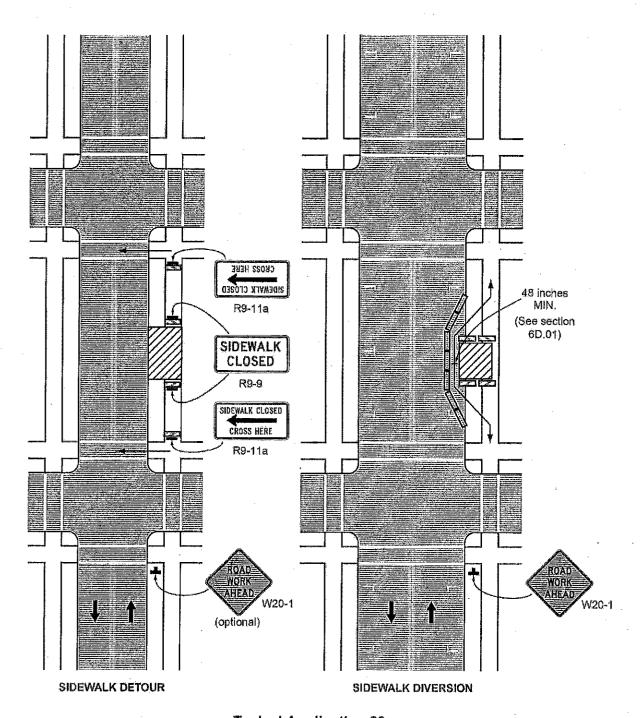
H-28. Sidewalk Detour or Diversion (TA-28)
